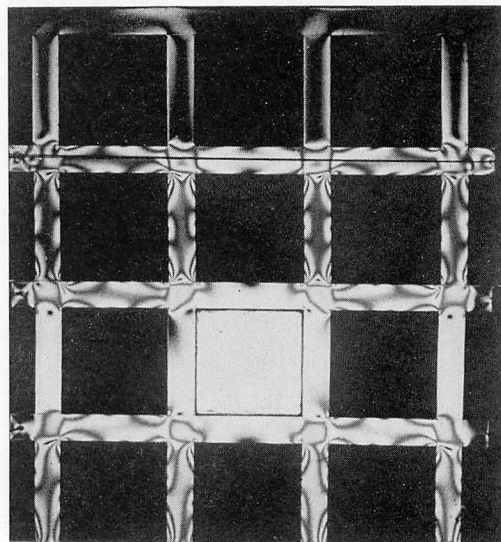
b Isochromatics of Frame with a Wall Panel Subjected to Lateral Forces on fourth Floor Beams
